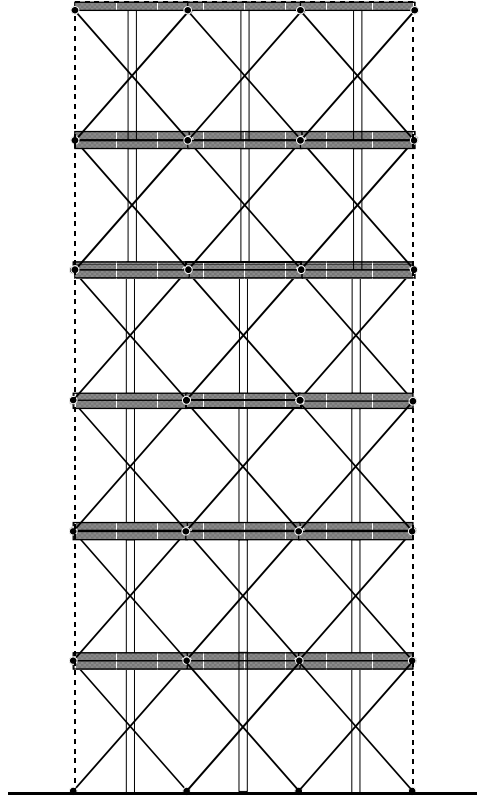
A Planar Shear Wall Modelled by Braced Wide Column Analogy
